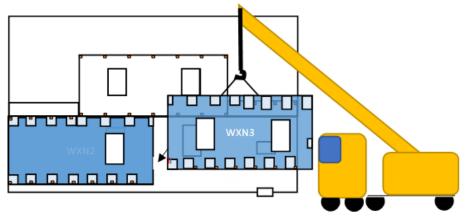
INSTALLATION OF THE FAÇADE PANELS WITH A CRANE.
